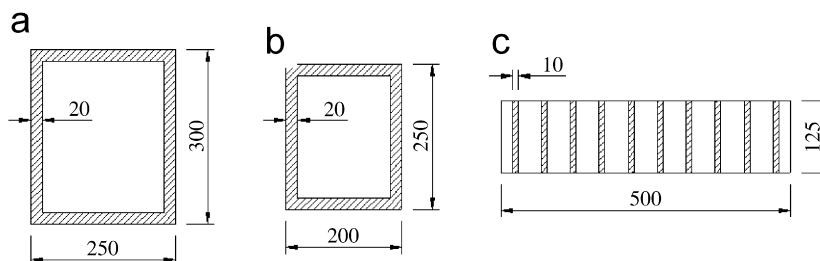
Sections of bridge members: (a) member of bridge frame; (b) supporting beams; (c) deck units.
